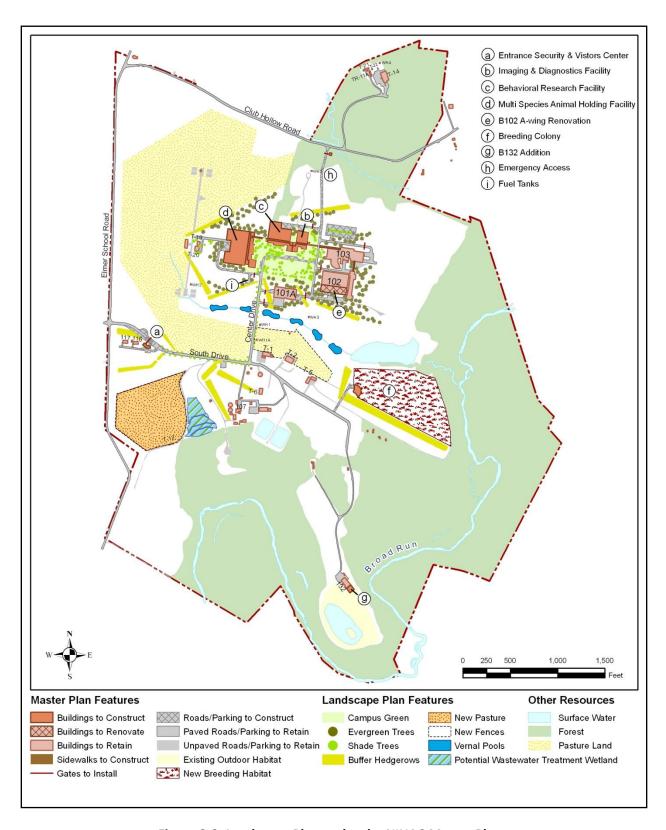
Landscape Plan under the NIHAC Master Plan
